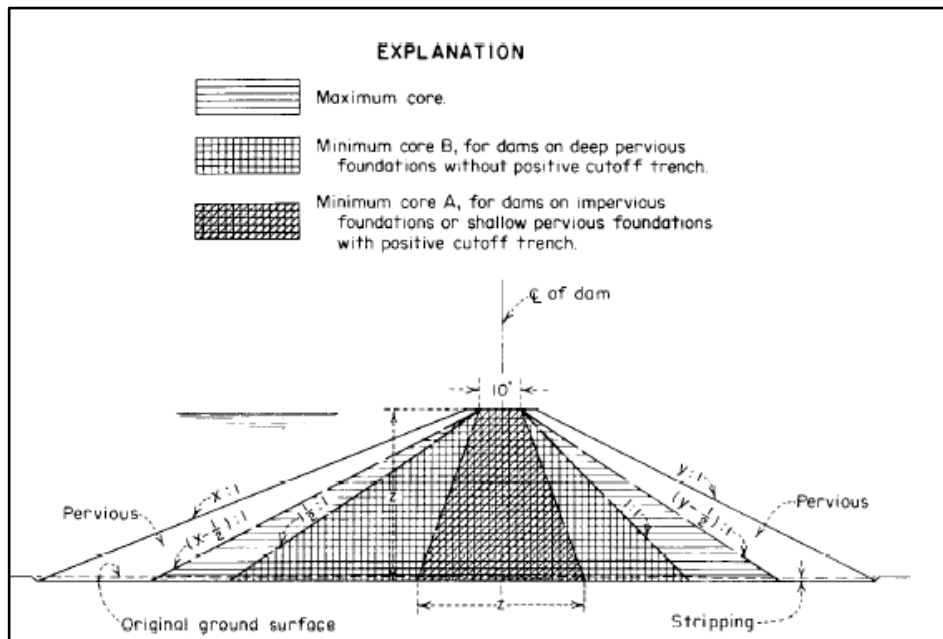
Zoning design guidelines for embankment dams on pervious and impervious foundations (Source: USBR 1987)
